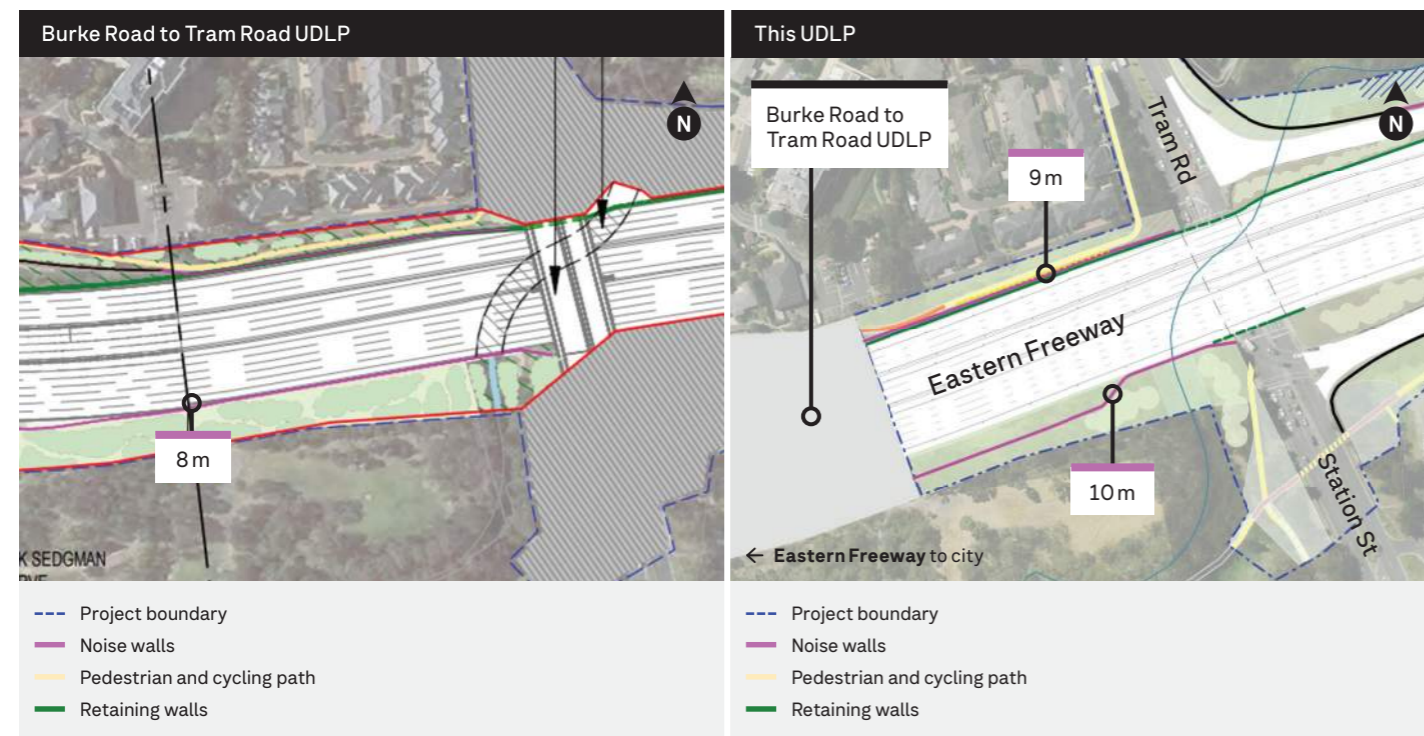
Noise wall design in Eastern Freeway Upgrades – Burke Road to Tram Road UDLP and this UDLP
